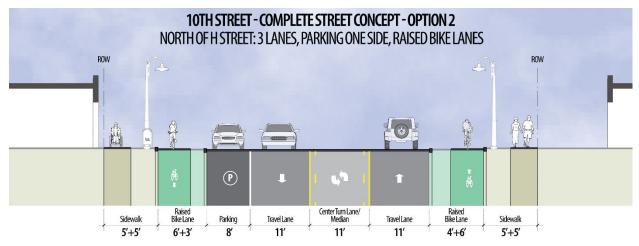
Proposed Complete Street Concept - Option 2 Condition North of H Street
